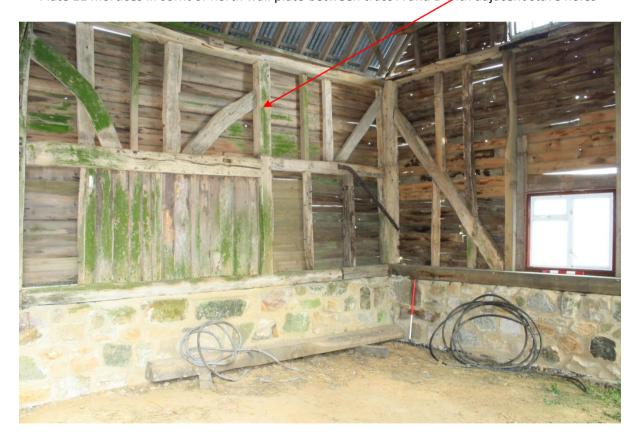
north elevation between truss C and D (scales 1m and 50cm)
